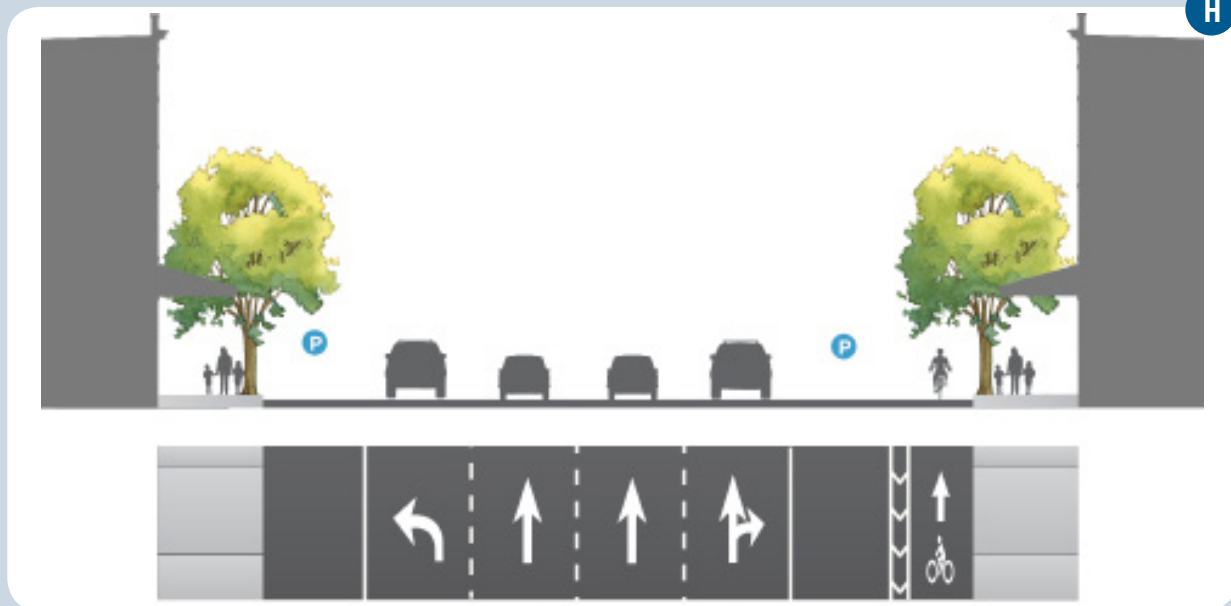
Foothill Blvd (Between A Street and B Street) Proposed Short-Term Improvements
